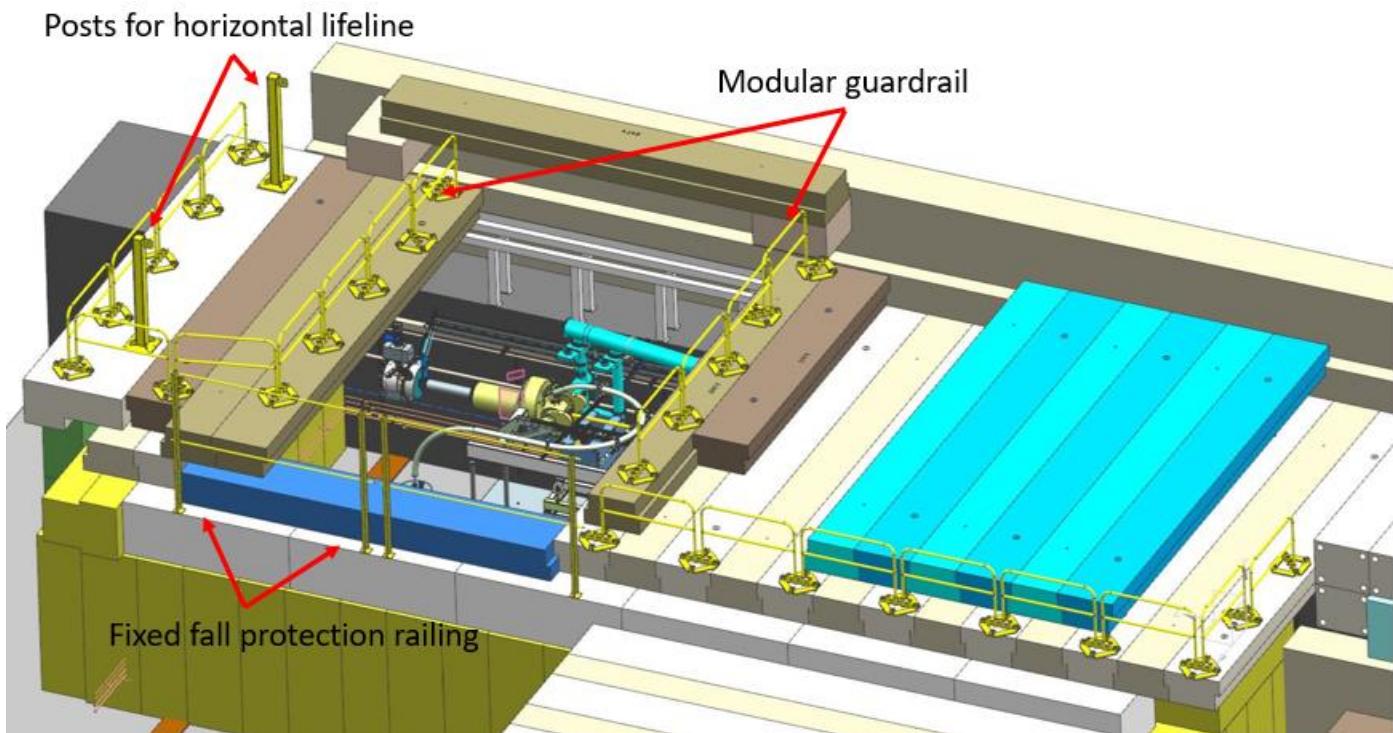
modular guardrail around the exposed edge of the Cave2 rooftop, and at both edges of the hole formed by roof tile removal. Fixed fall protection at the west-side of the opening. Posts at the north side of the rooftop are used to secure the horizontal lifeline. A stairway (not shown) provides path to exit the roof for North Side worker once ceiling tiles have been removed.
